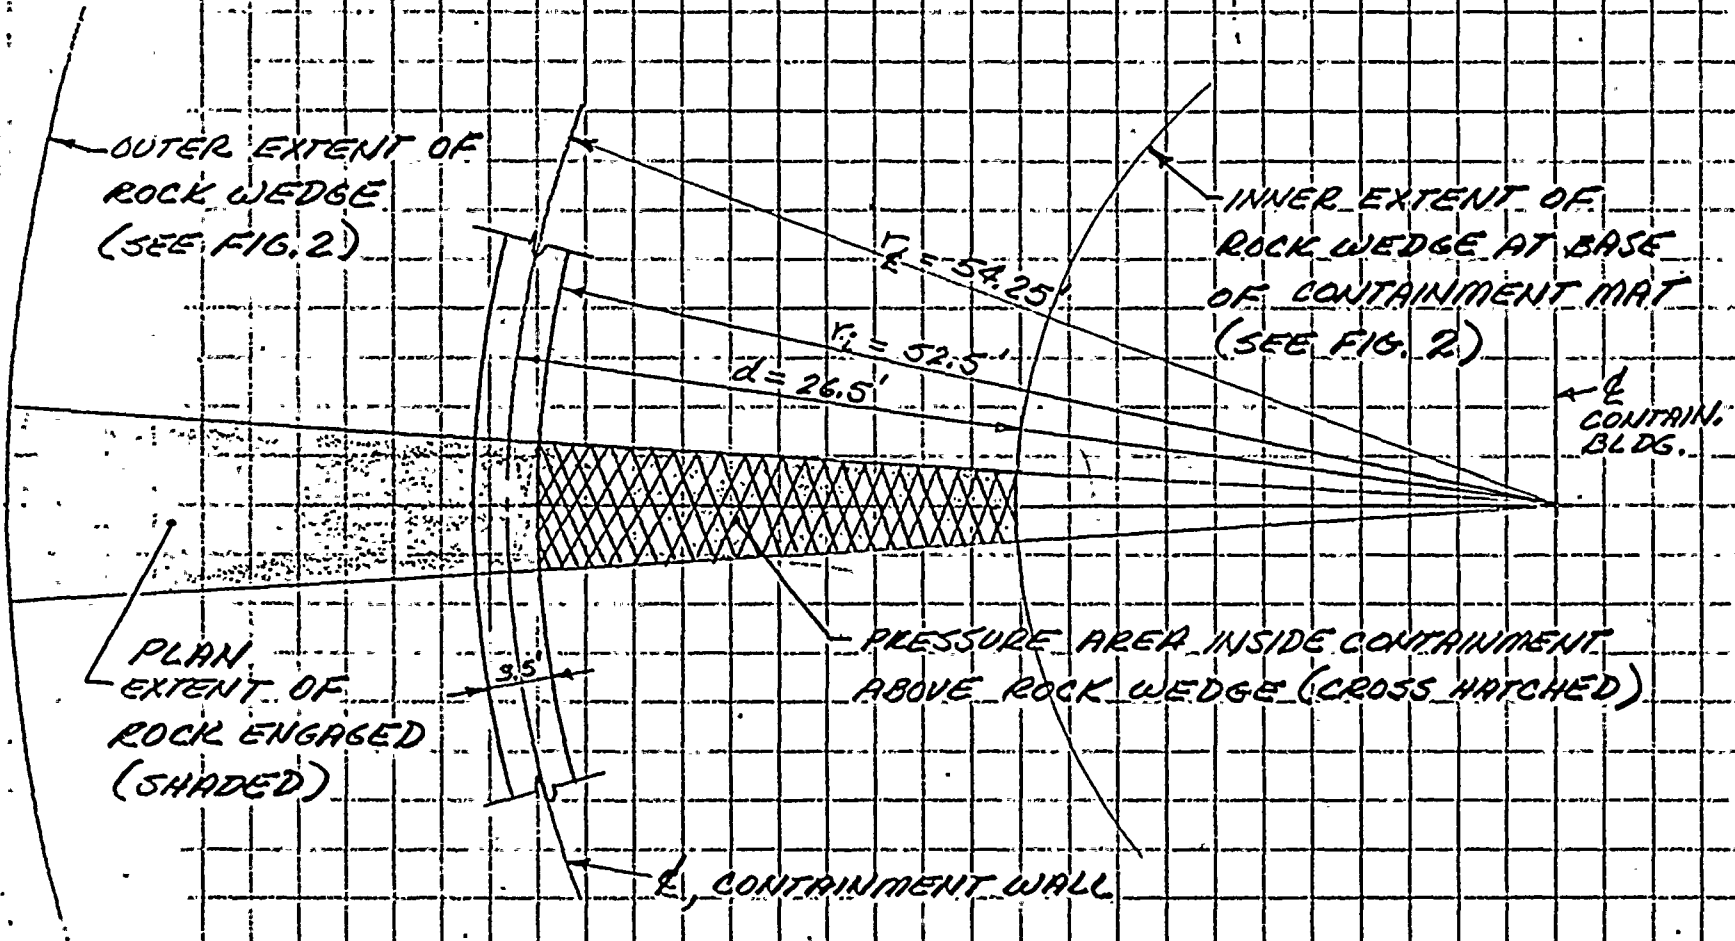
PLAN VIEW OF ROCK AND PRESSURE AREA
